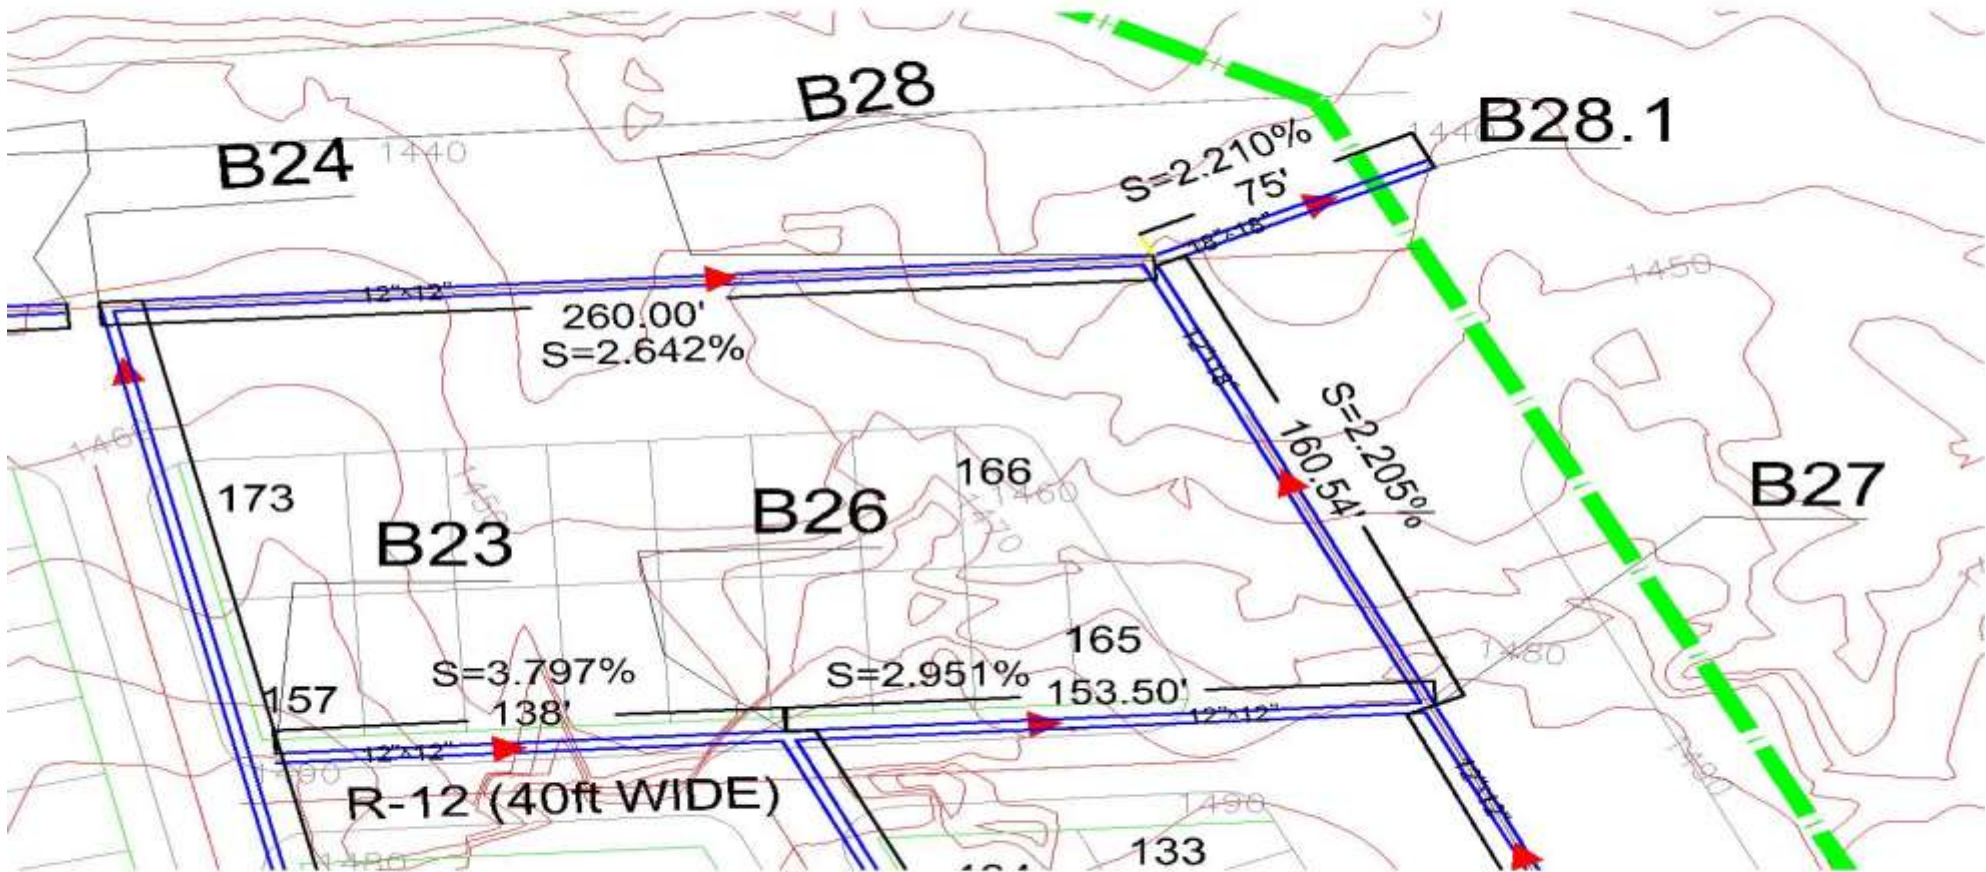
Storm drainage layout plan of Sub-catchment-2 part two
